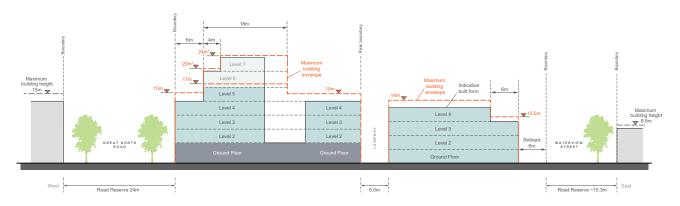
Section C - Proposed building envelopes for Waterview Street site exhibited for comment
